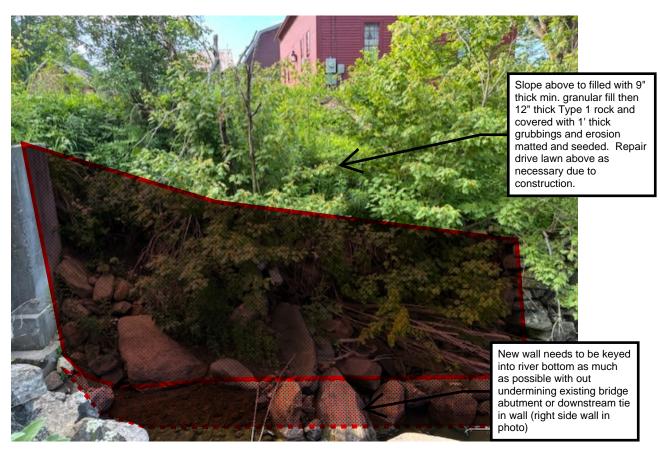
Looking at damaged wingwall from opposite bank
